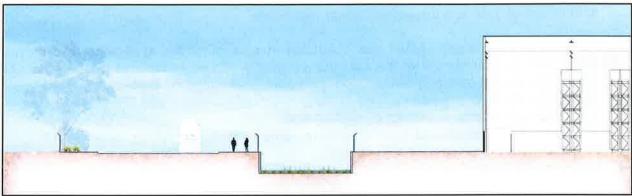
Proposed OSD Design (Source: Applicant's EIS)
